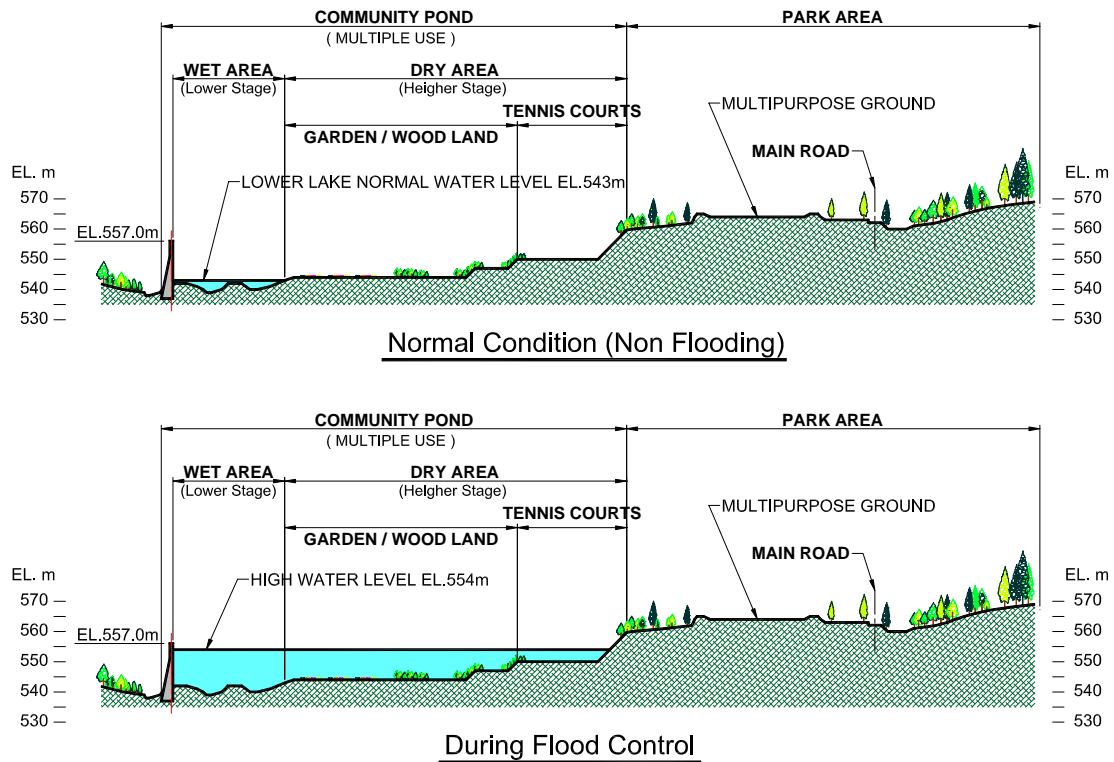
Cross Sectional Layout of Community Pond
